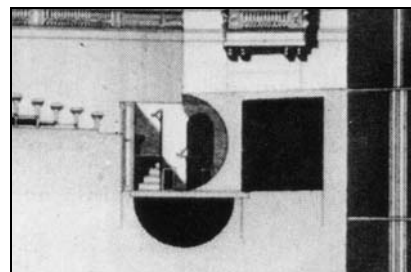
N. Ledoux: Besançon Theatre design; longitudinal section. Detail ([6] by Forsyth)
